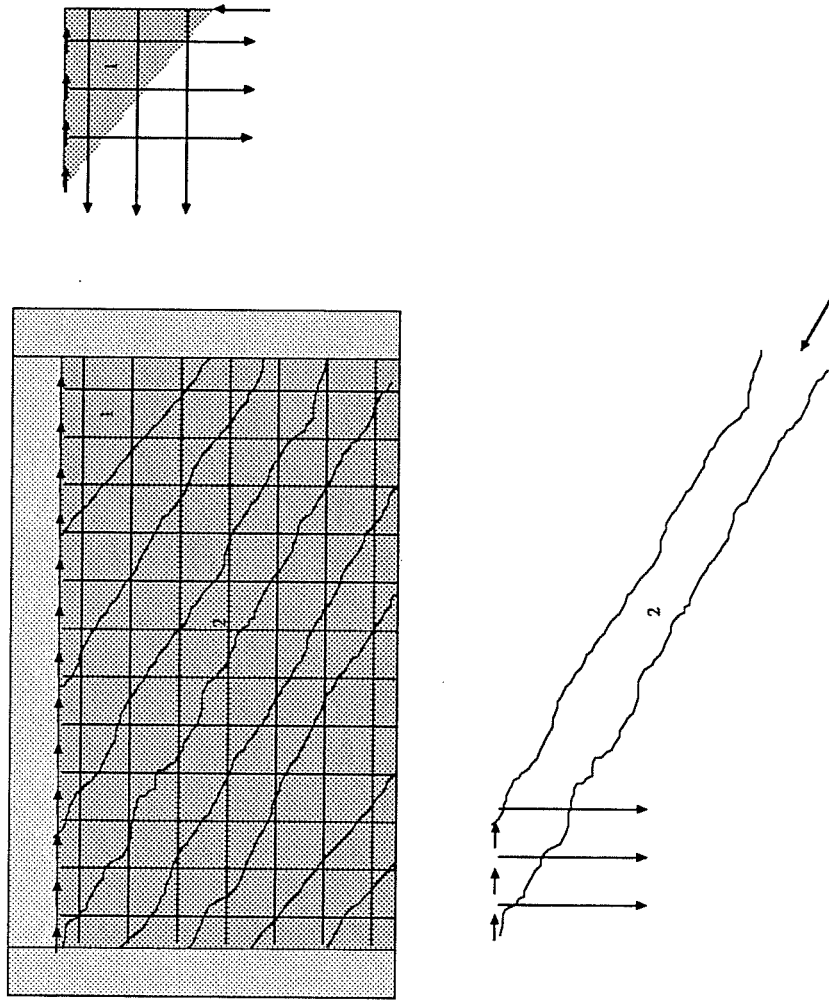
Equilibrium of a Cracked Squat Shear Wall Under Lateral Load
